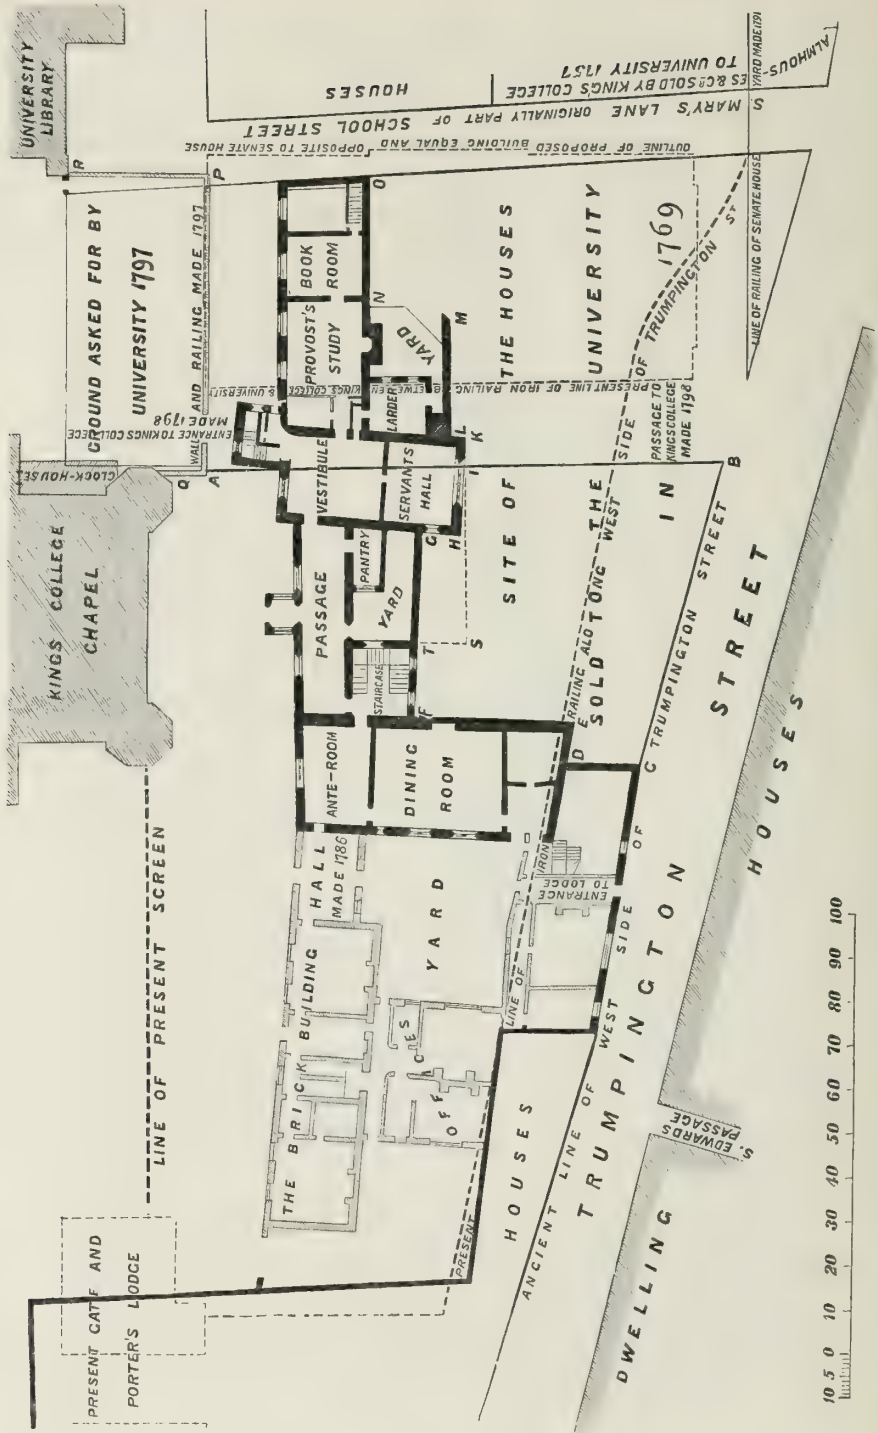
Ground-plan of the Provost's Lodge, with the adjoining streets and buildings.
